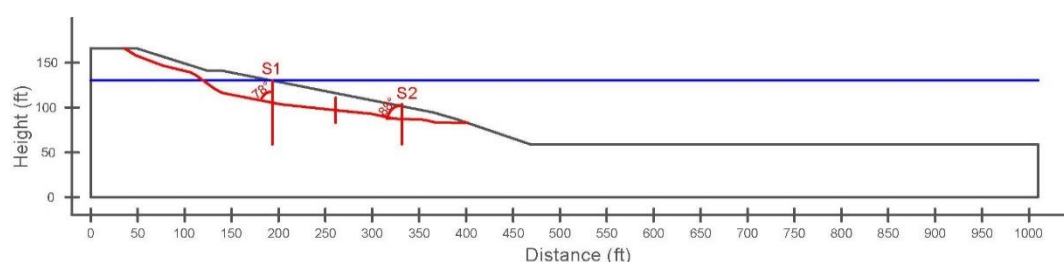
Sub-sectioning of the cross-section and failure plane for Jamuna Bridge
